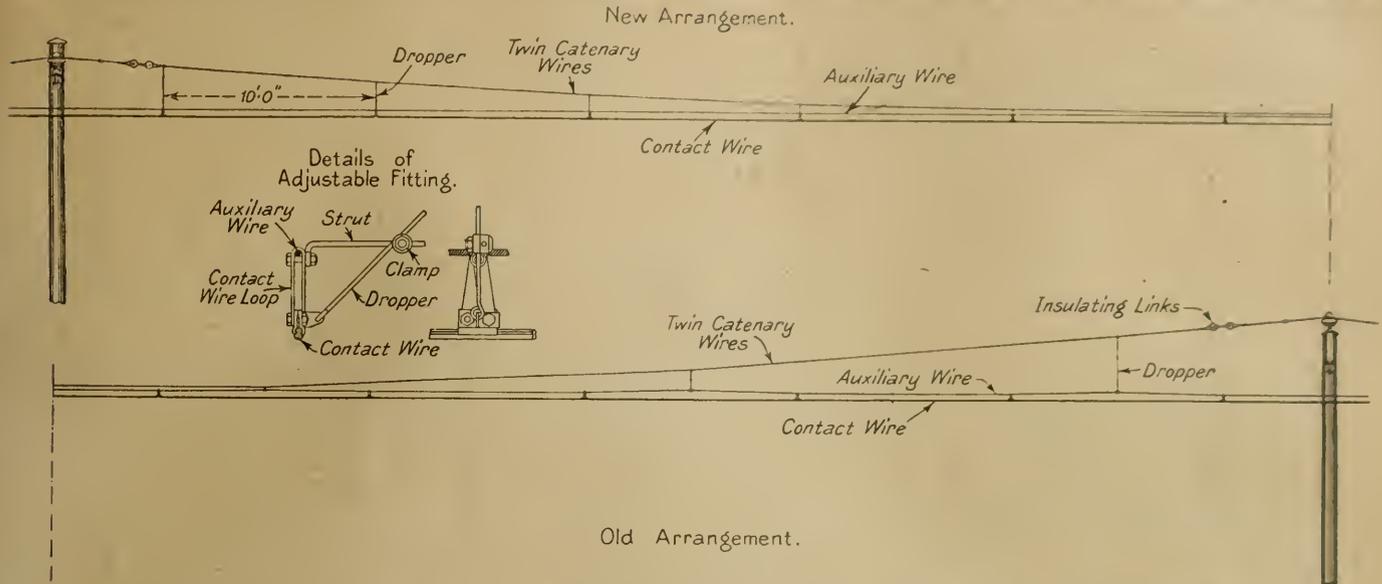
ELEVATION OF NEW AND OLD ARRANGEMENTS OF OVERHEAD EQUIPMENT ON A STRAIGHT STRETCH.
